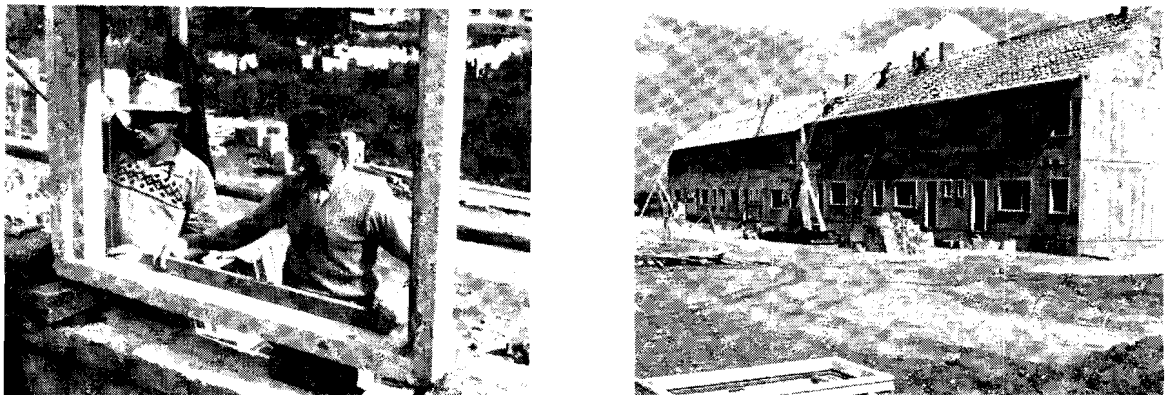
Accurately dimensioned prefabricated concrete window frames.
